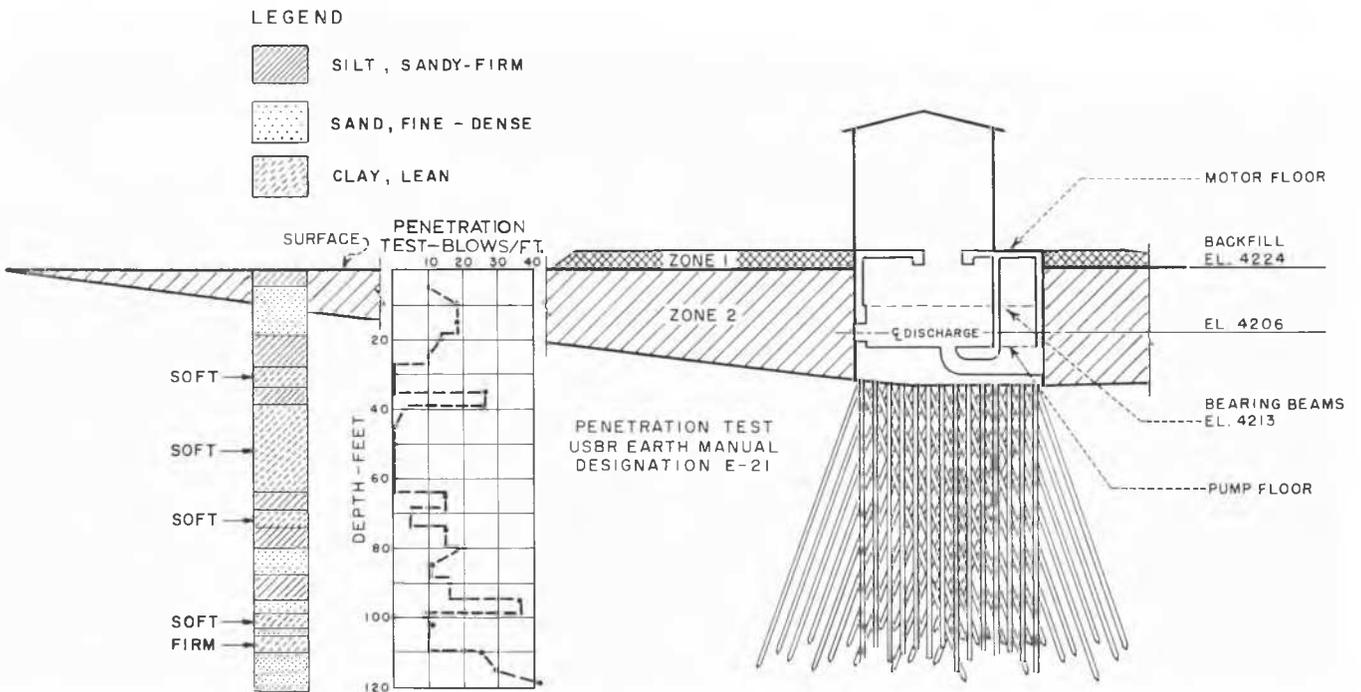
Pumping plant elevation view showing pile foundation and soil conditions.
